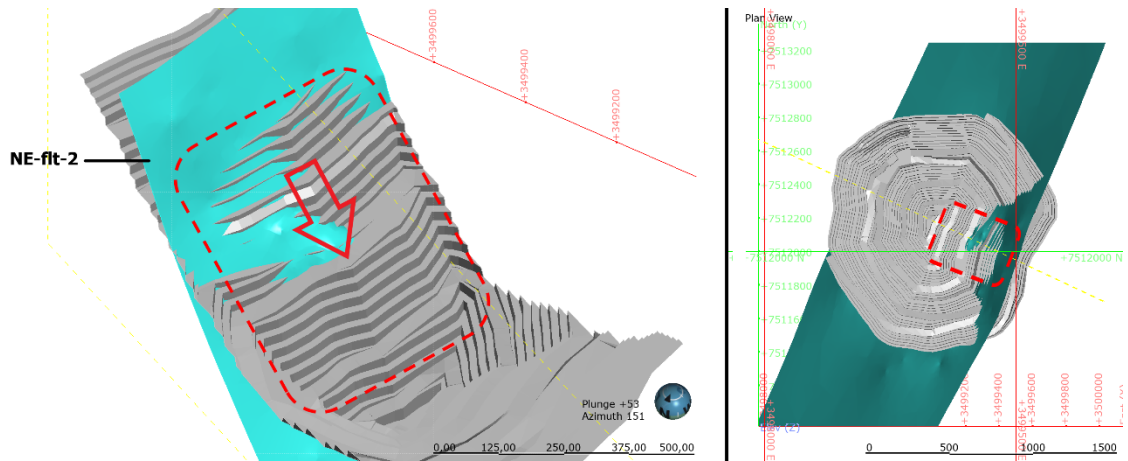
Potential planar failure from NE-ft-2 in the north east wall. Sliced 3D view of Stage 5 pit.
